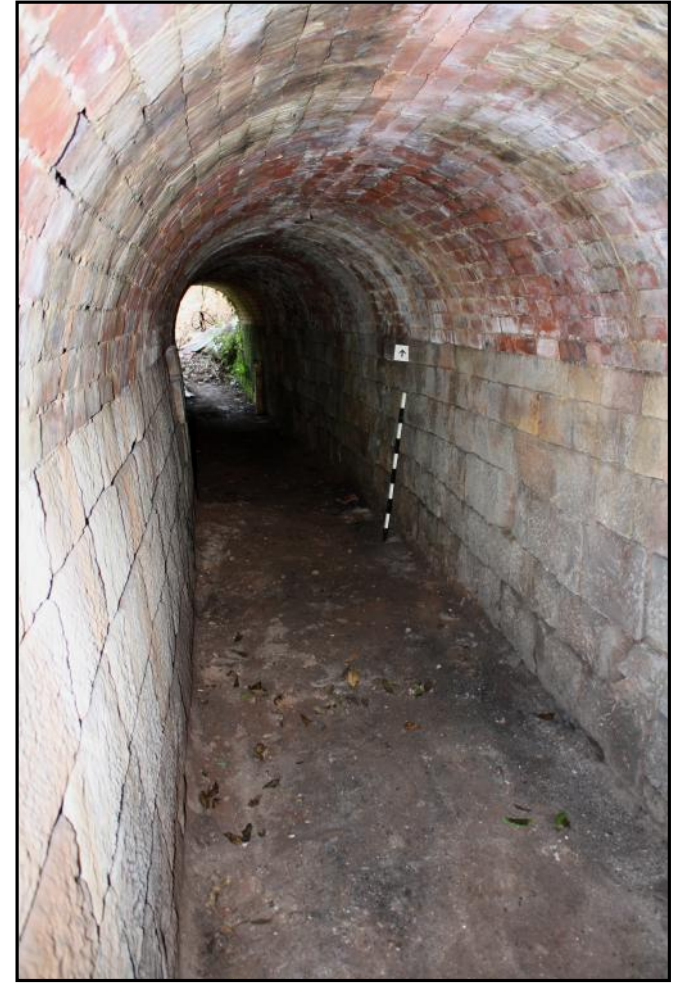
View looking north within the Long Tunnel at Duffield Bank.
